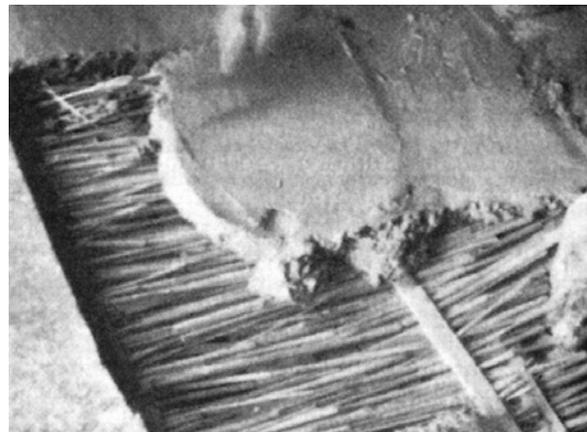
Straw or reed reinforced plaster floor, used in the East Midlands of England from Elizabethan times up to the 19th century. (Newby)
